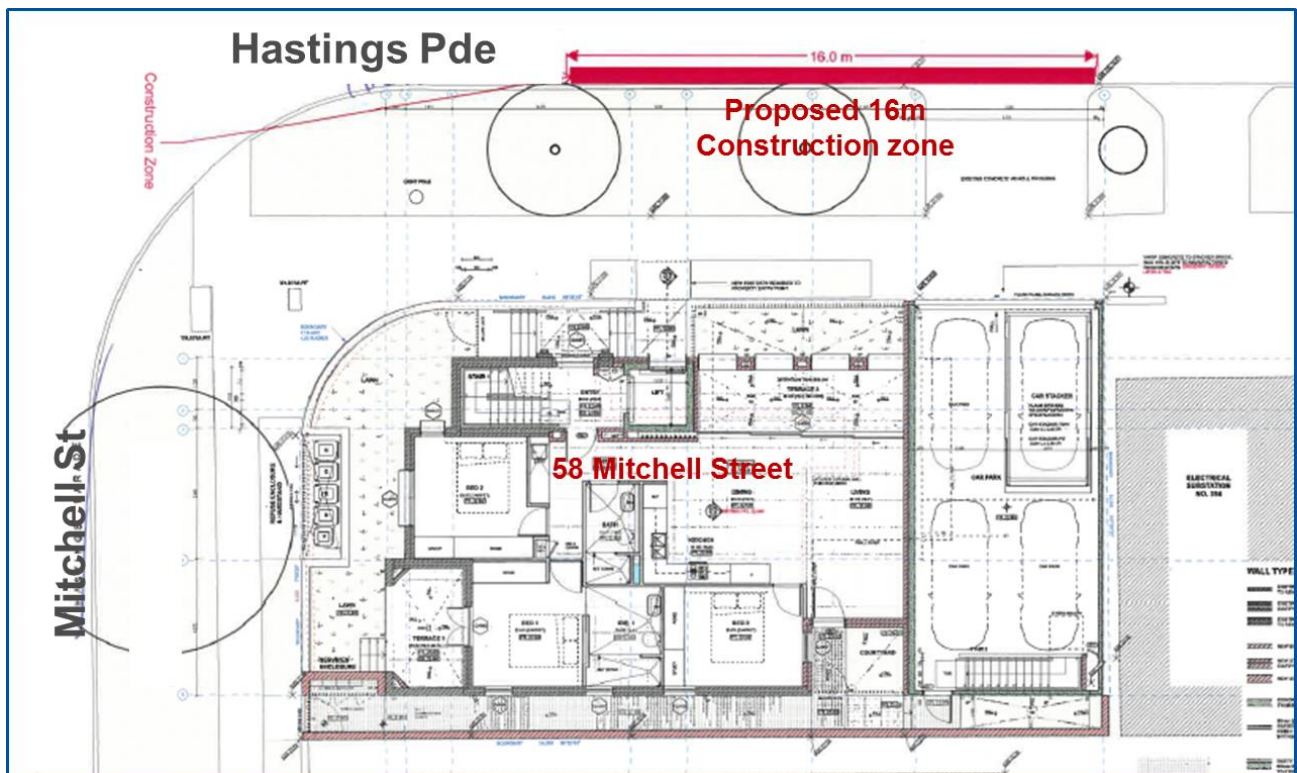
Proposed construction zone on Hastings Parade along 58 Mitchell Street, Bondi Beach
